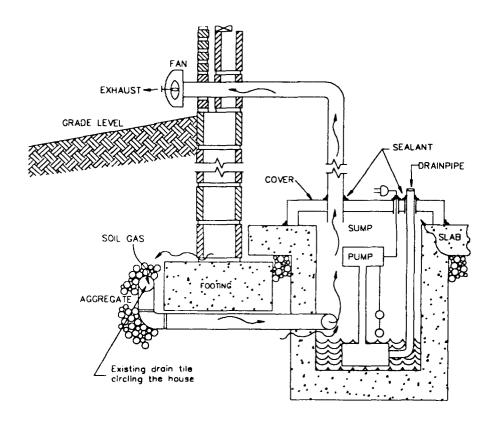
Drain tile ventilation where tile drains to sump. (Source: Radon Reduction Techniques for Detached Houses, Technical Guidance, EPA/625/5-86/019 [USEPA, June 1986]).
